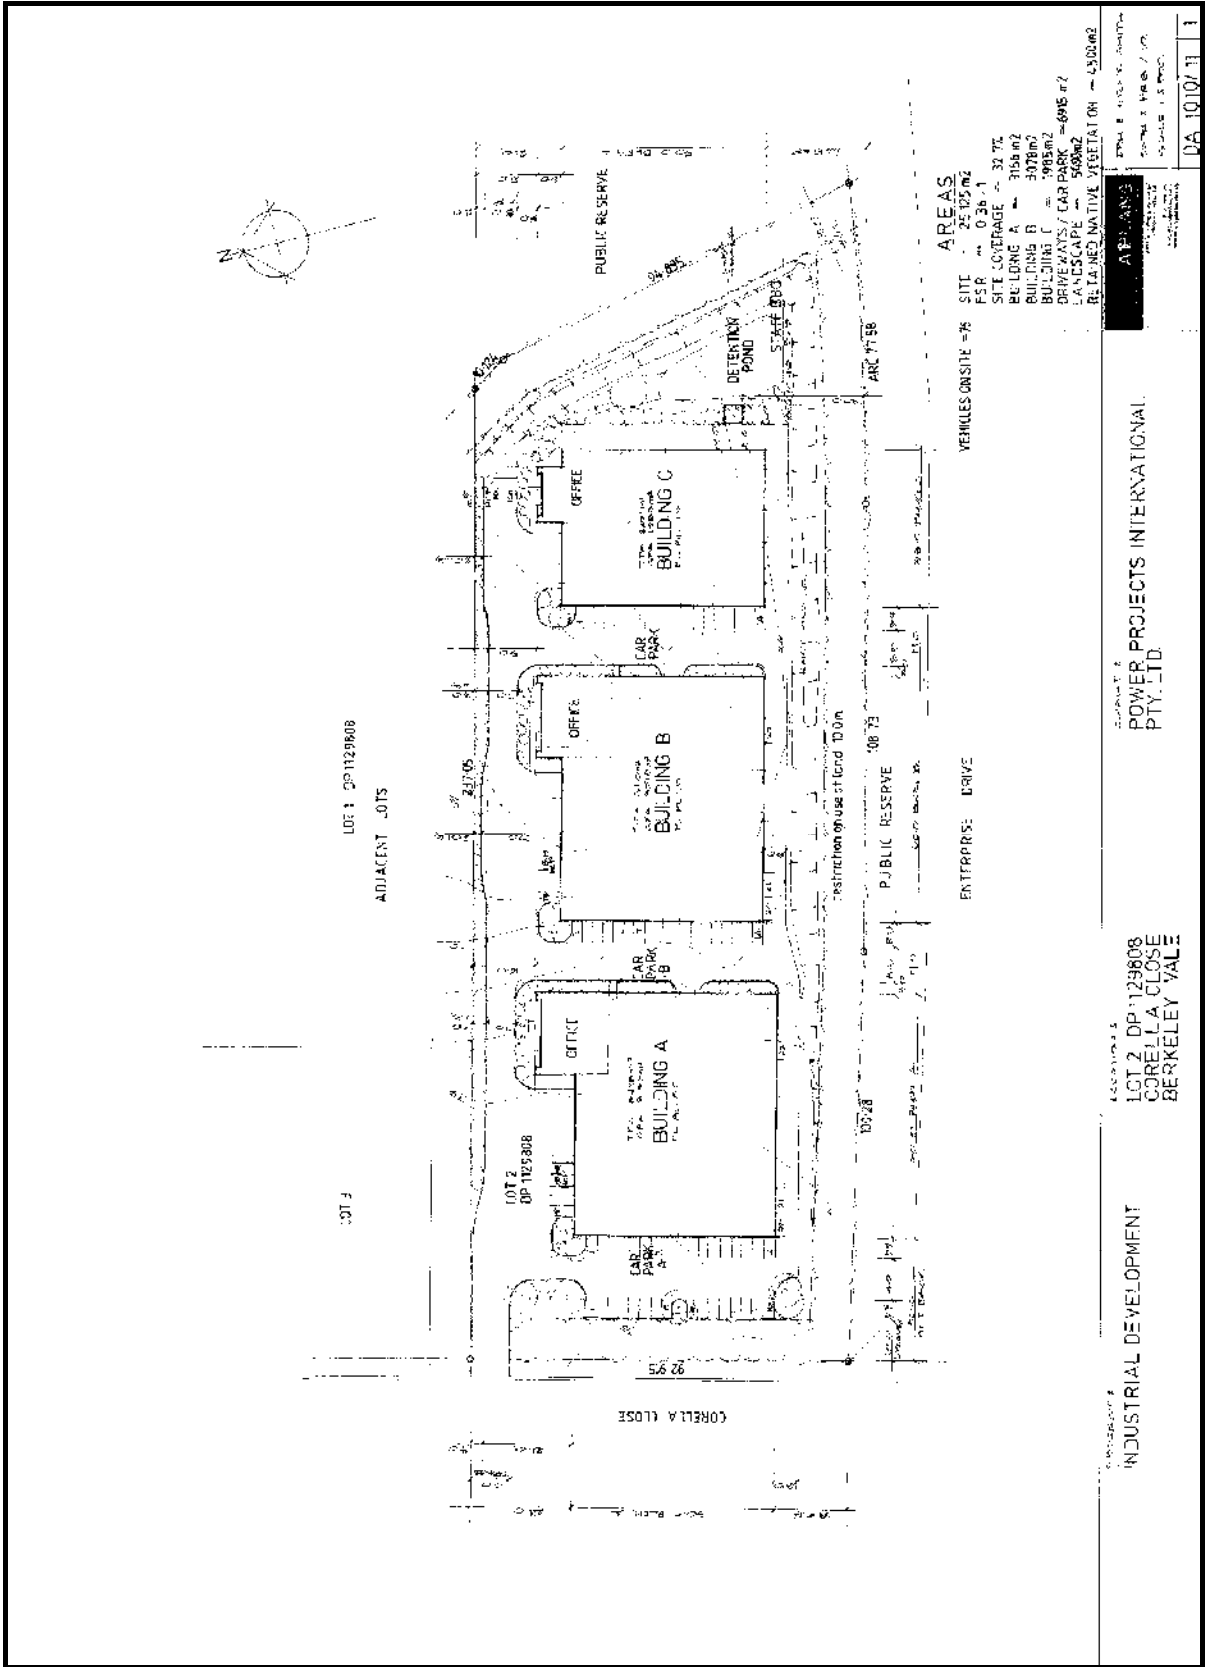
Original site plan (since amended to provide continuous perimeter access road as shown in Attachment 1.)
